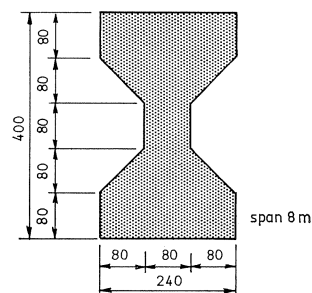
Cross-section of full-size beams (CUR Report 13) span 8 m. (dimensions in mm).
